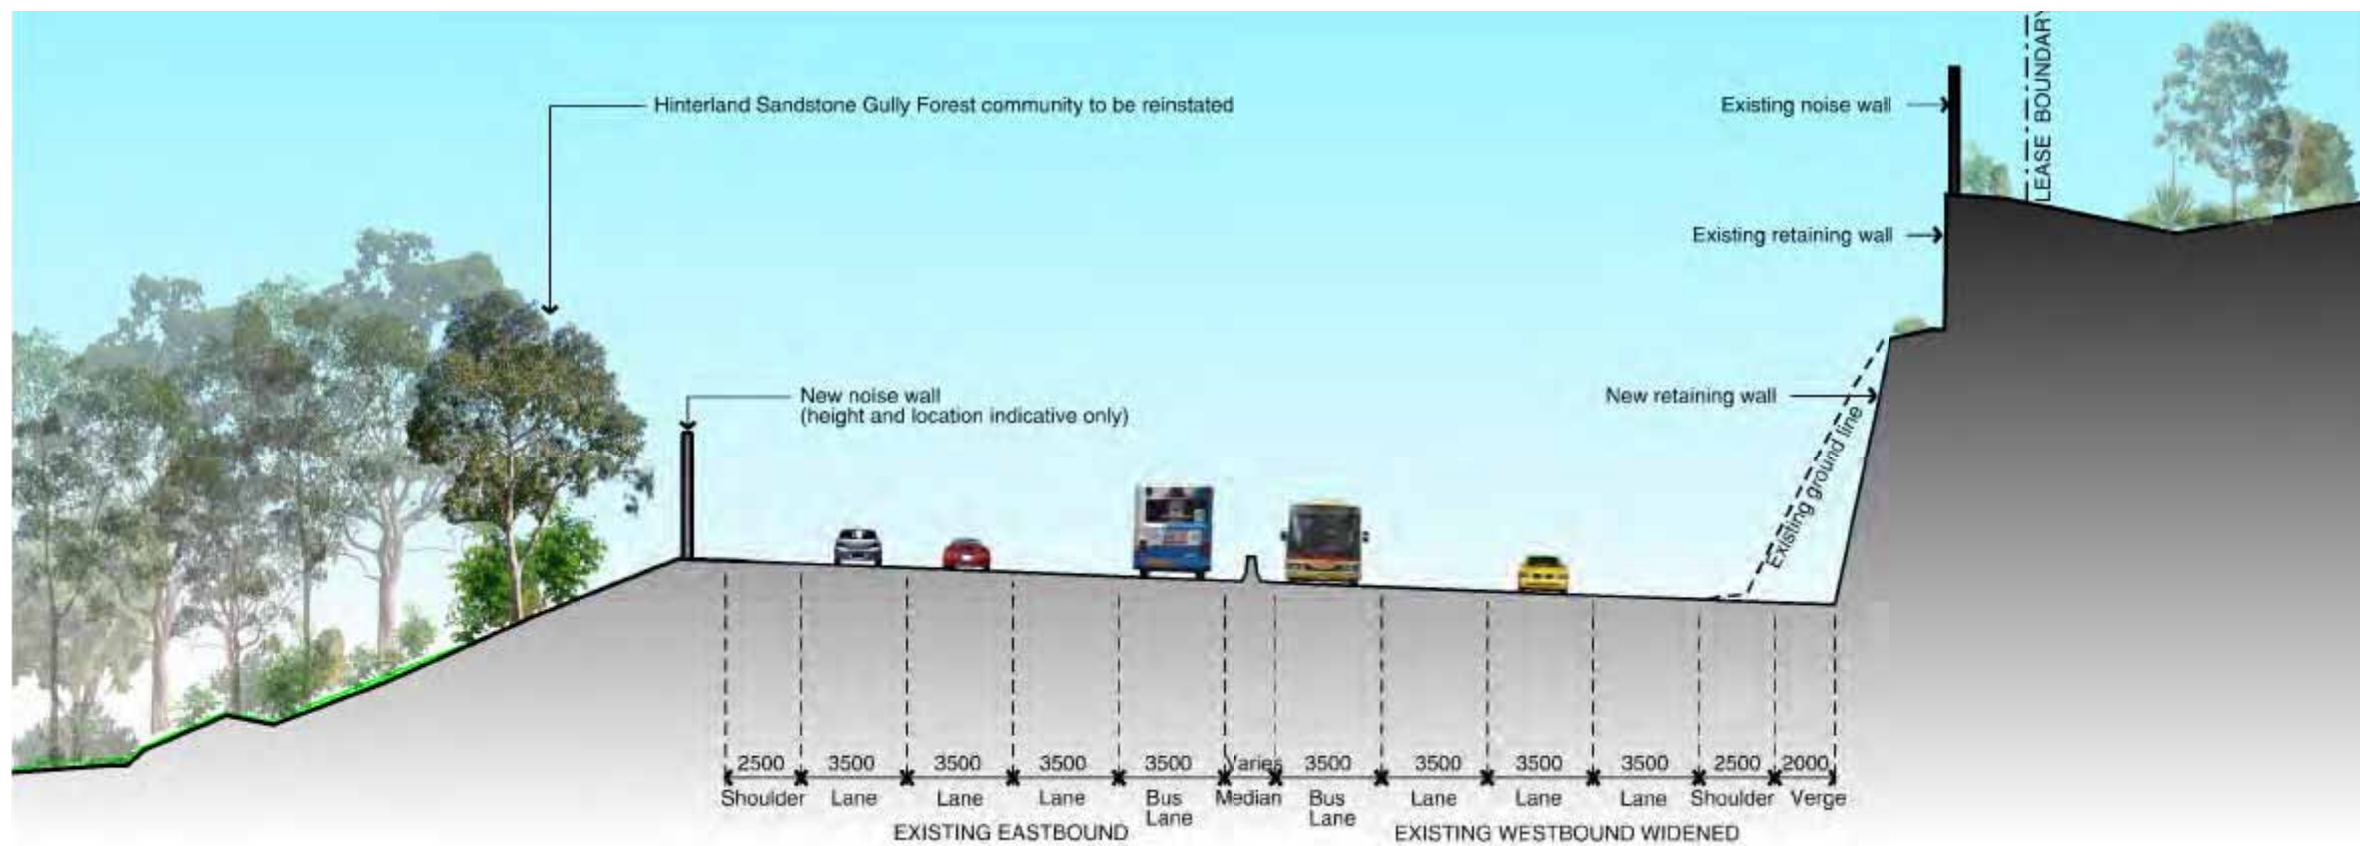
Stn 10350 Large cut with shotcrete - Proposed
